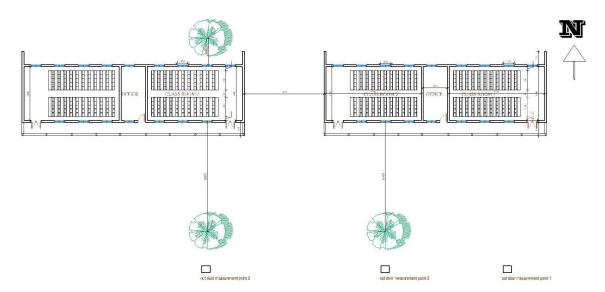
Floor plan of the observed class rooms (Source: Author's field work 2022).
